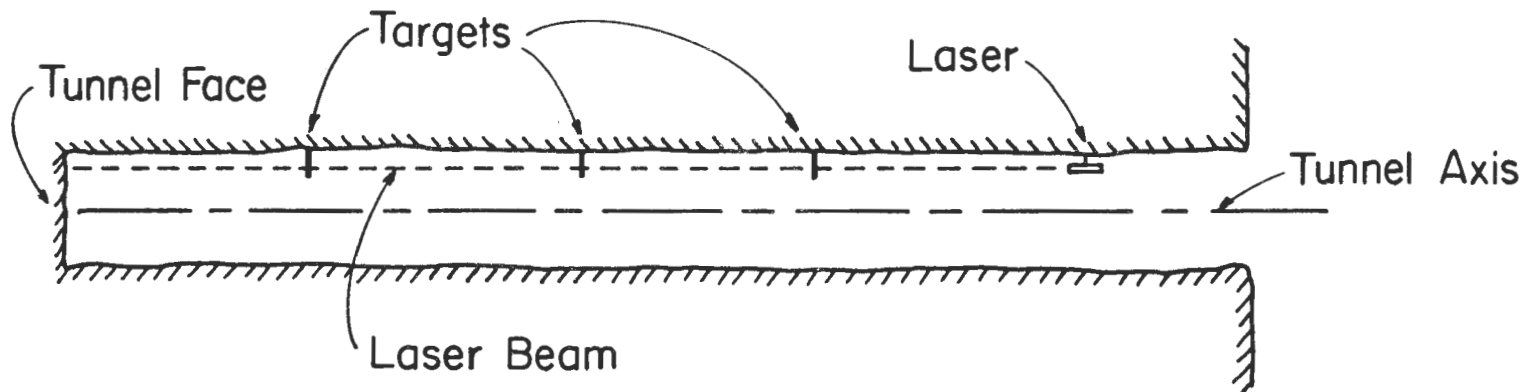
FIGURE I-II - PLAN VIEW OF TUNNEL SHOWING LASER AND TARGET LOCATIONS
